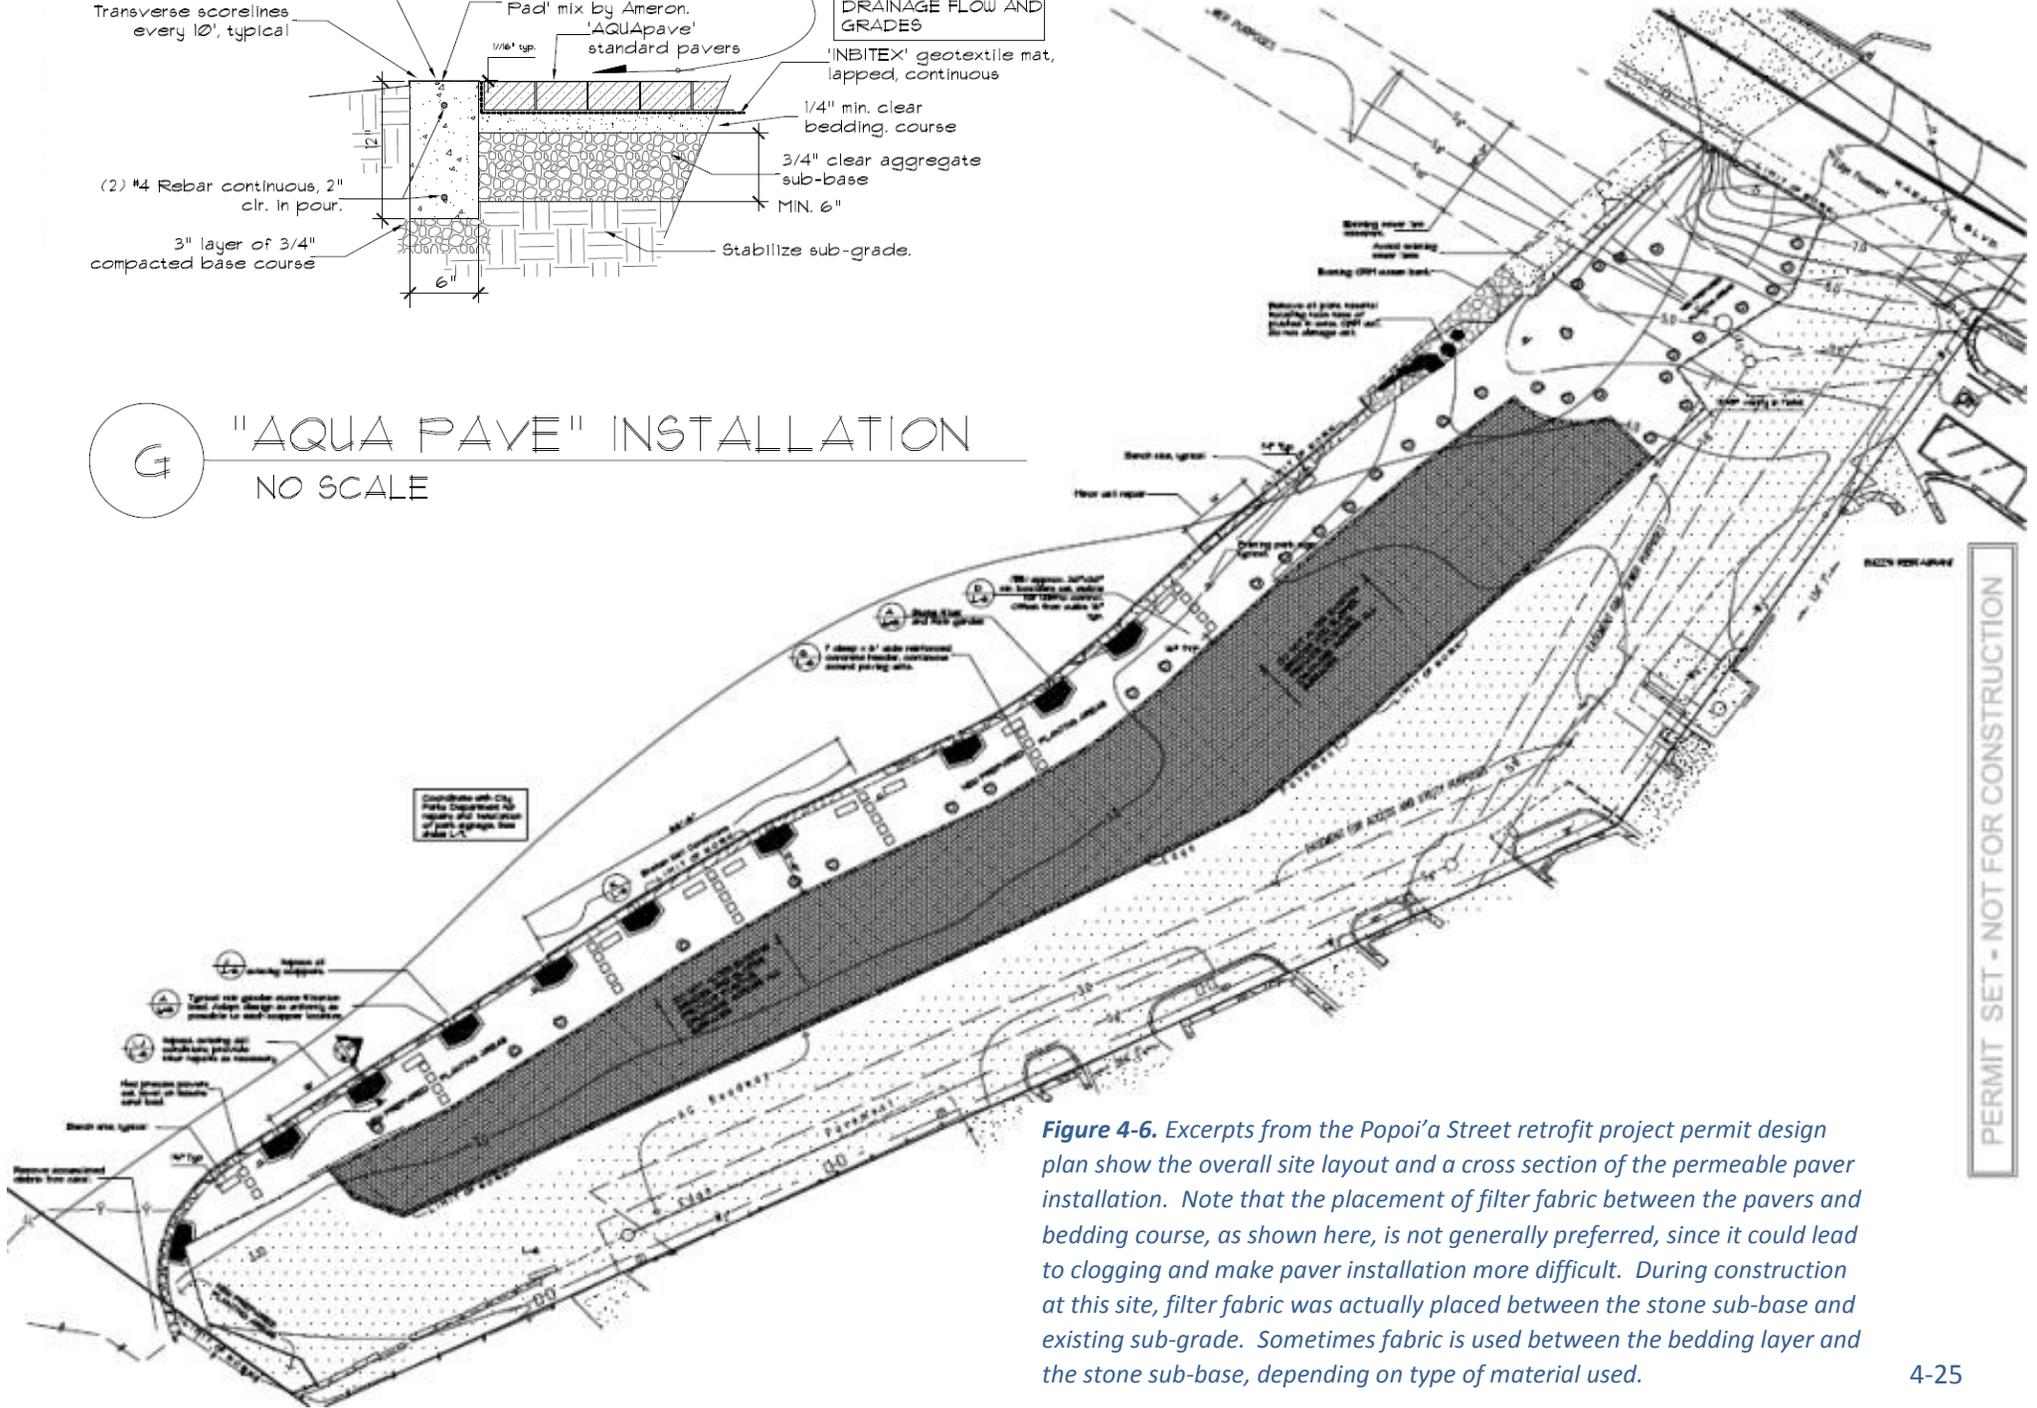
Excerpts from the Popo'i'a Street retrofit project permit design plan show the overall site layout and a cross section of the permeable paver installation. Note that the placement of filter fabric between the pavers and bedding course, as shown here, is not generally preferred, since it could lead to clogging and make paver installation more difficult. During construction at this site, filter fabric was actually placed between the stone sub-base and existing sub-grade. Sometimes fabric is used between the bedding layer and the stone sub-base, depending on type of material used.
